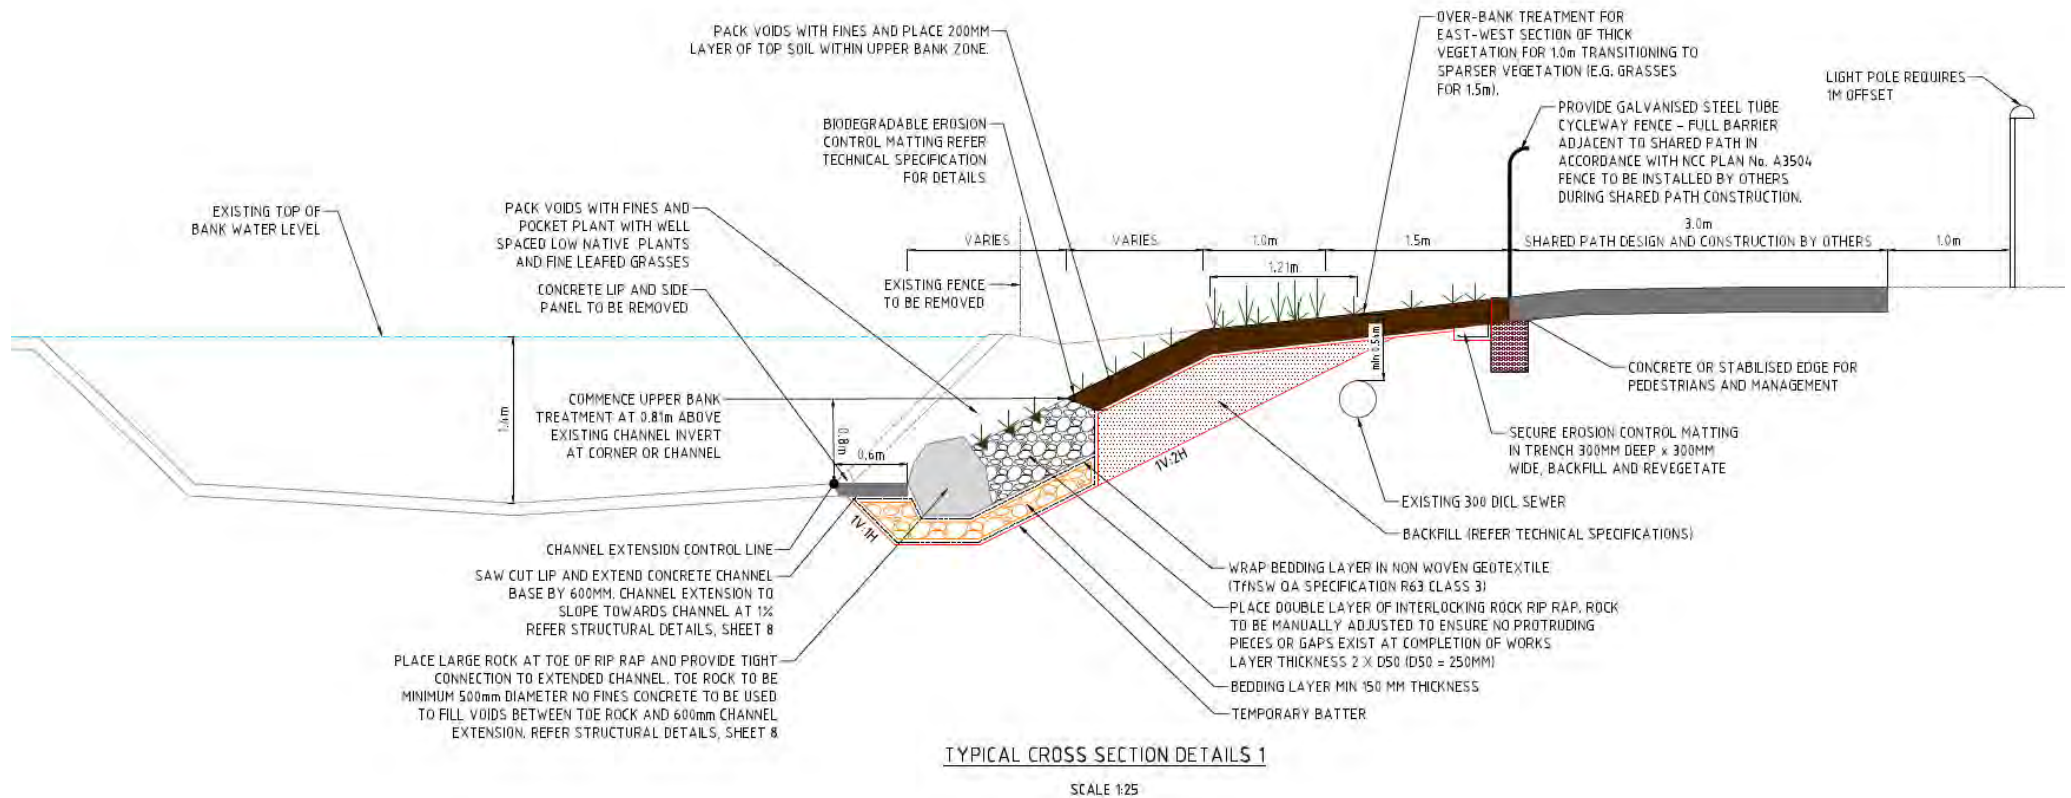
Dark Creek Heaton Park, Jesmond (Downstream) – Typical Cross-Section
